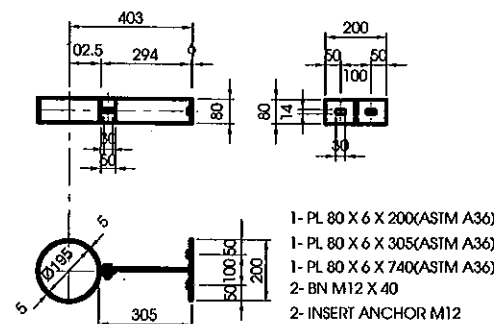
DETAIL WATER CONDUCT PIPE AT EXPANSION JOINT
